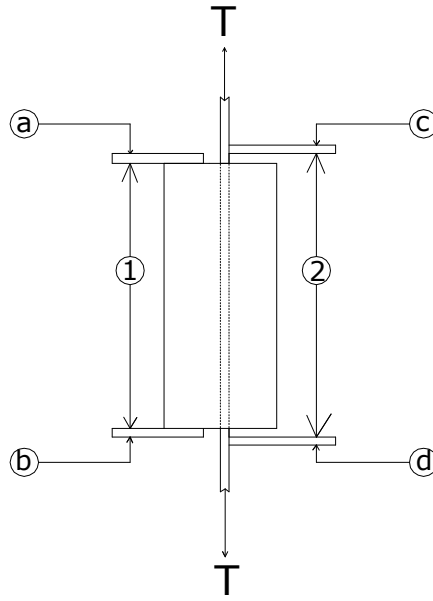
A schematic details of the tensile test setup and instrumentations' location.
